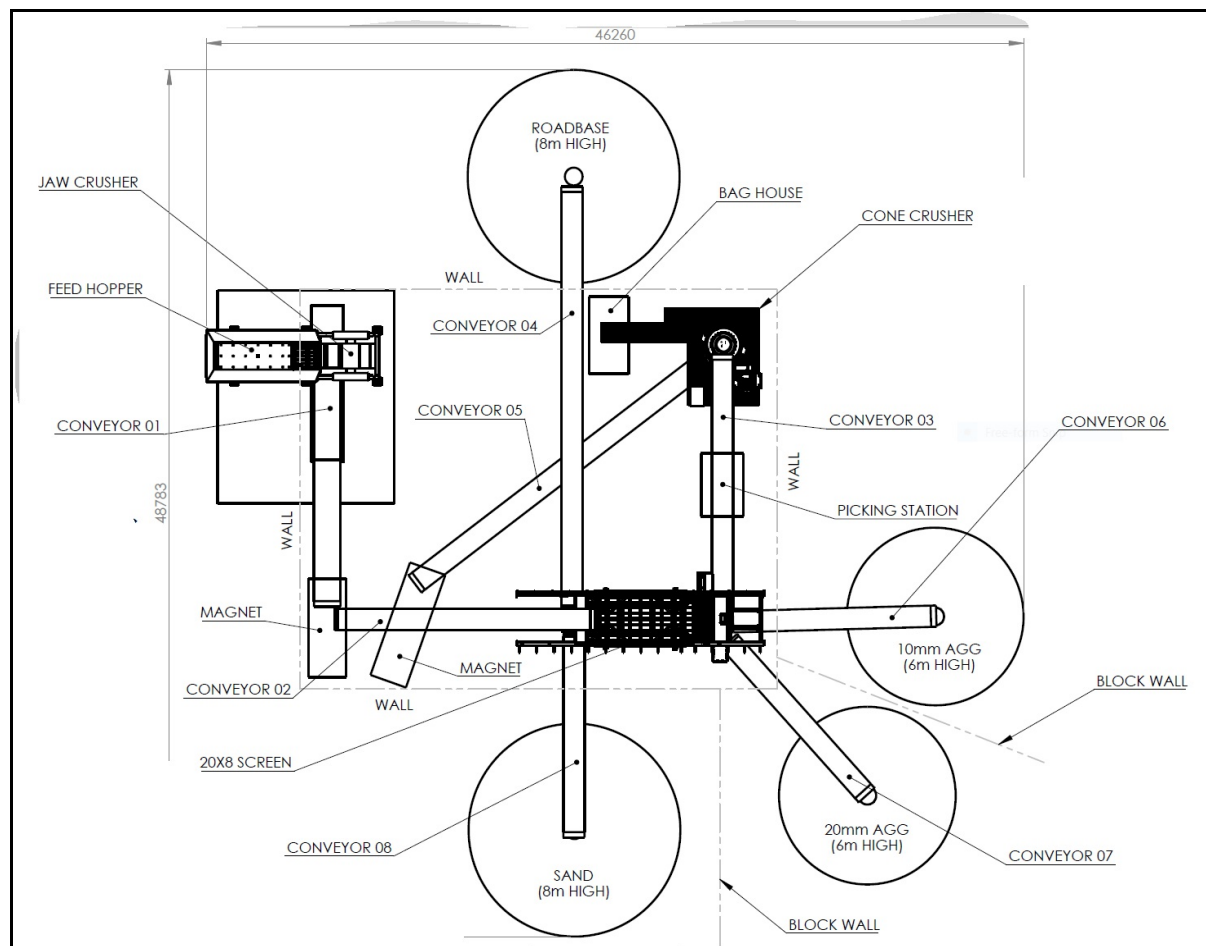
Plan showing the general layout of the proposed crushing plant.
